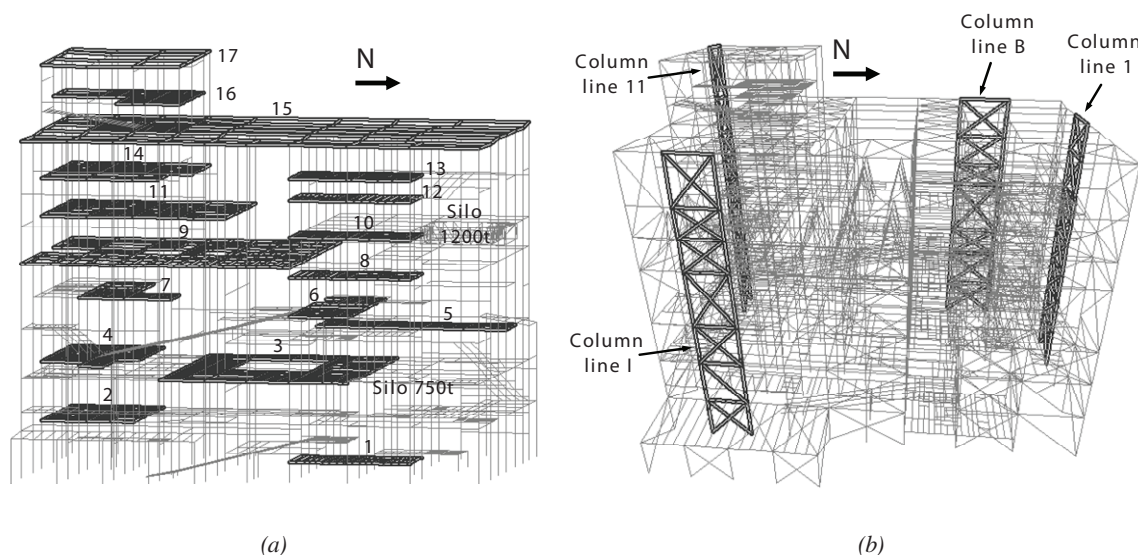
Building floors and braced frames studied: (a) location of floors; (b) elevation of the braced frames studied.
